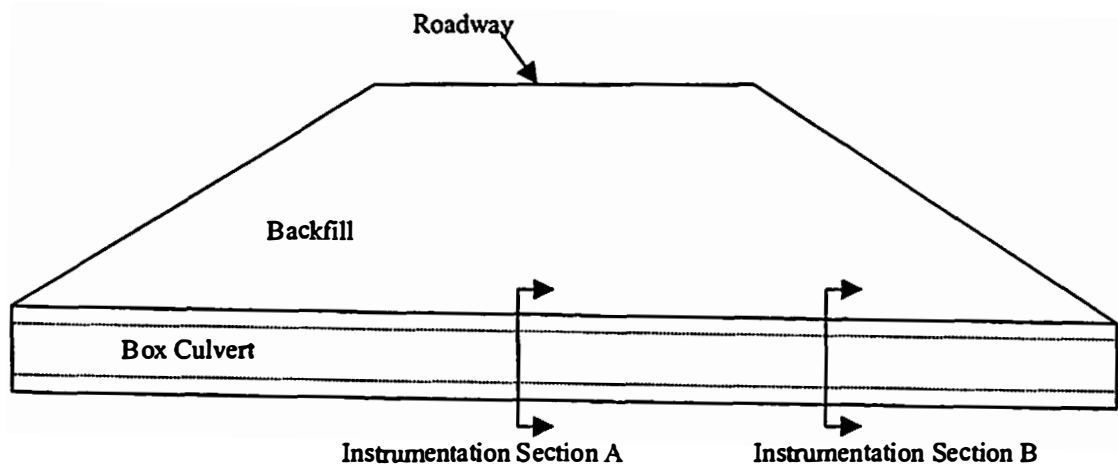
Schematic of Embankment and Culvert Cross-Section with Typical Sections A and B
